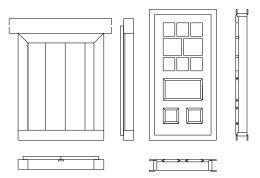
The Sljivo family house in the Brnjic village near Kakanj. Archaic and newer door designs
